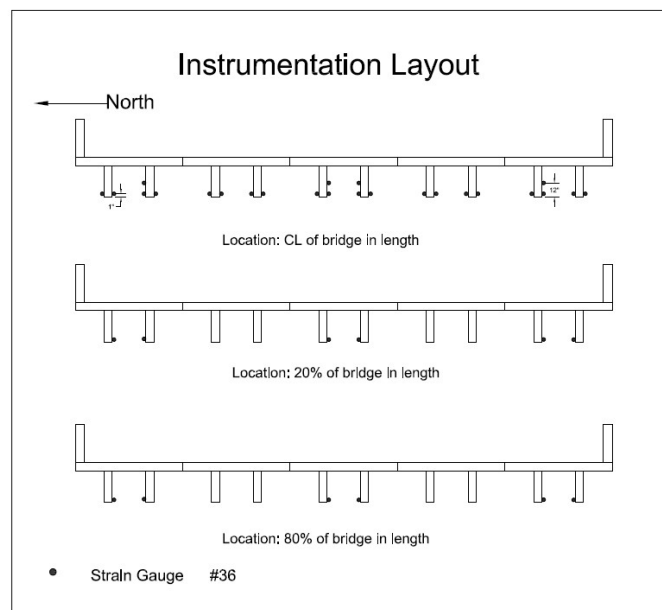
Instrumentation layout for proof load testing (Bridge 8761).
